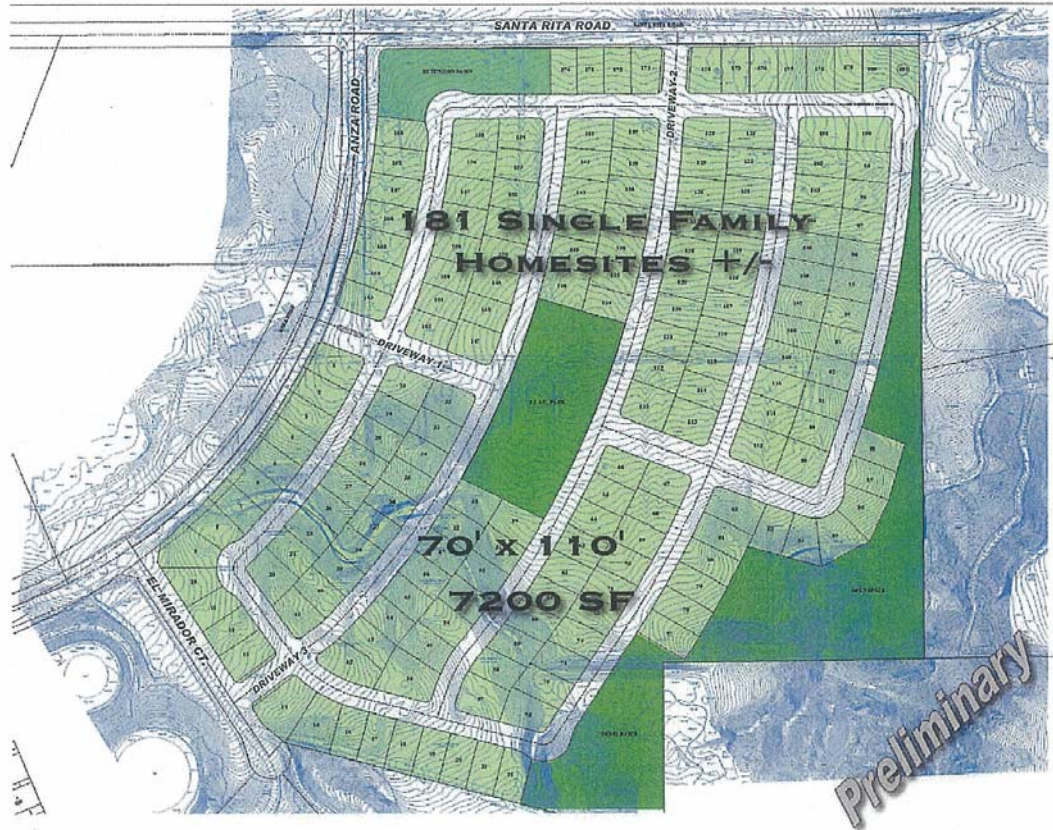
B illustrates the project site plan. This site plan is subject to refinement and revision, based on planning engineering, and environmental considerations.
